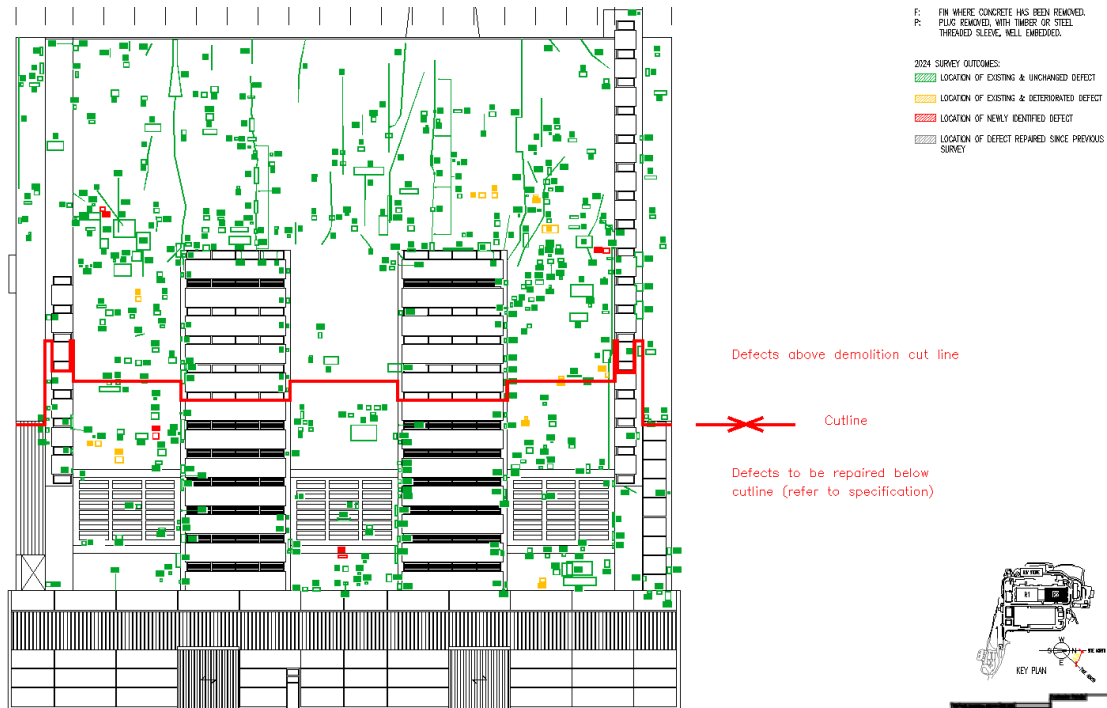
External defects – RB2 north elevation (sample extract)
